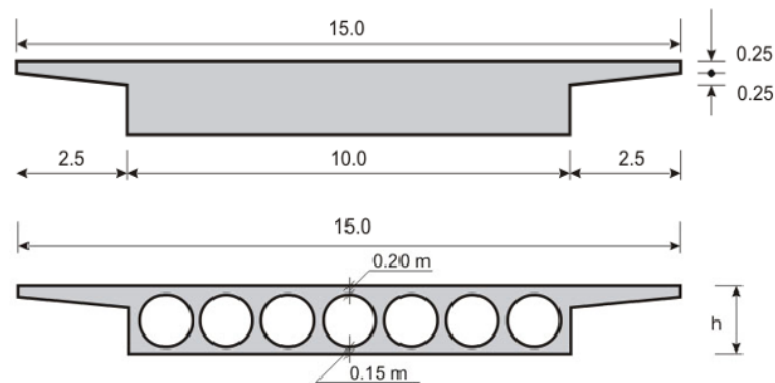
Typical cross-section of a slab bridge, including indicative dimensions (all in meter) [65] (adapted)
